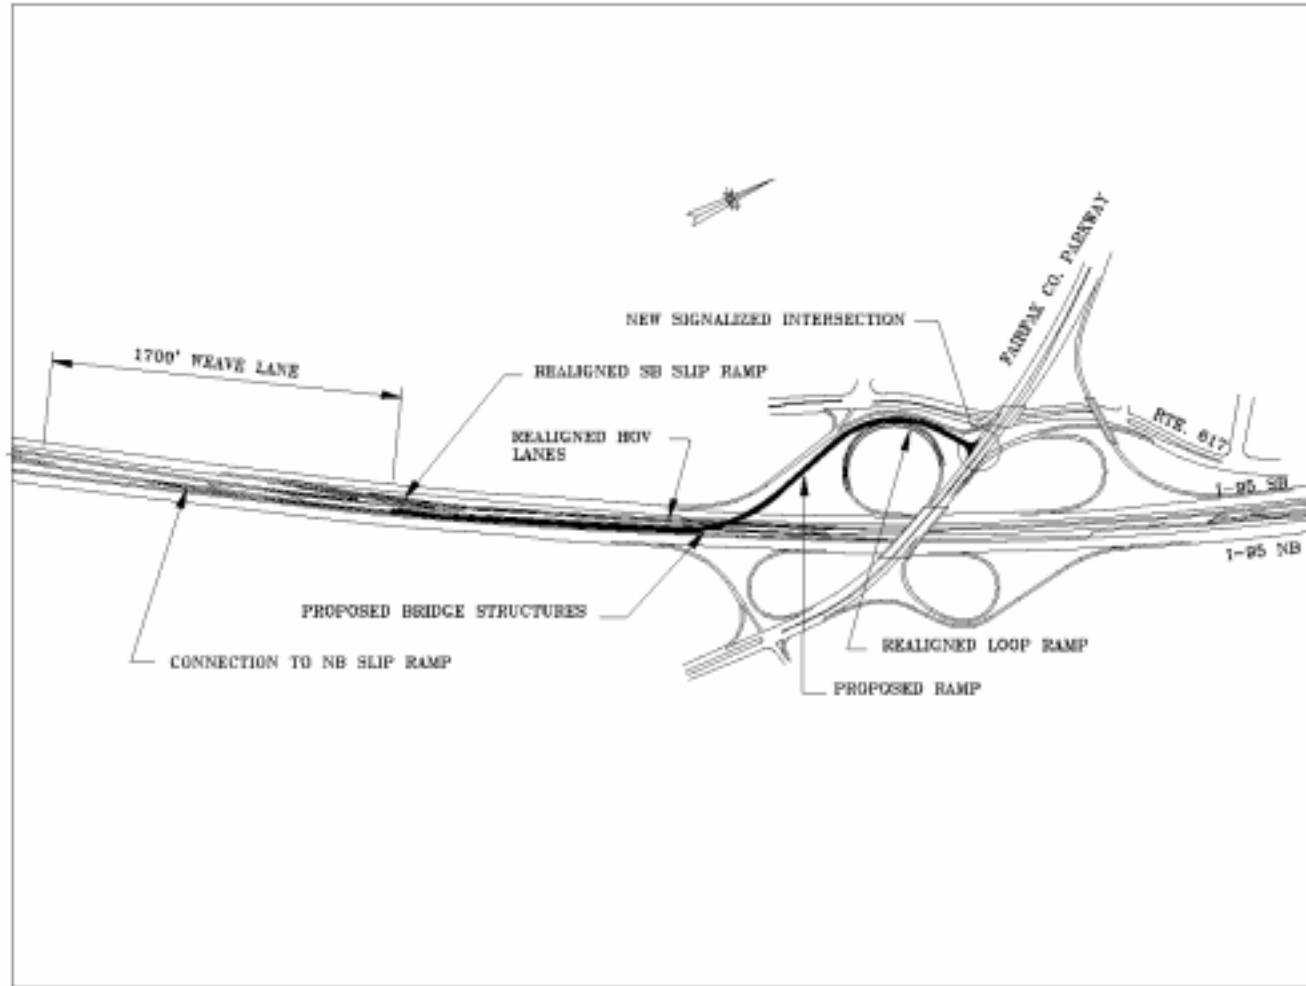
Conceptual Plan for HOV Ramp at the Fairfax County Parkway.
